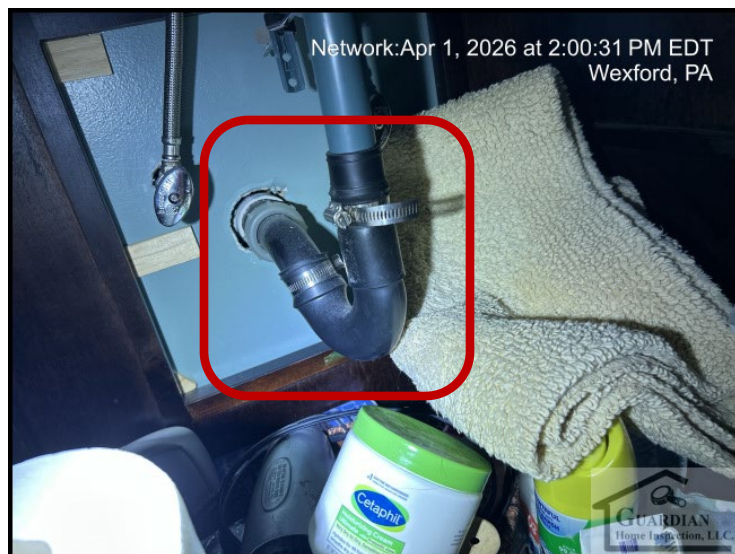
The rubber flex piping, under the basement bathroom sink, should be replaced with more common PVC piping.
